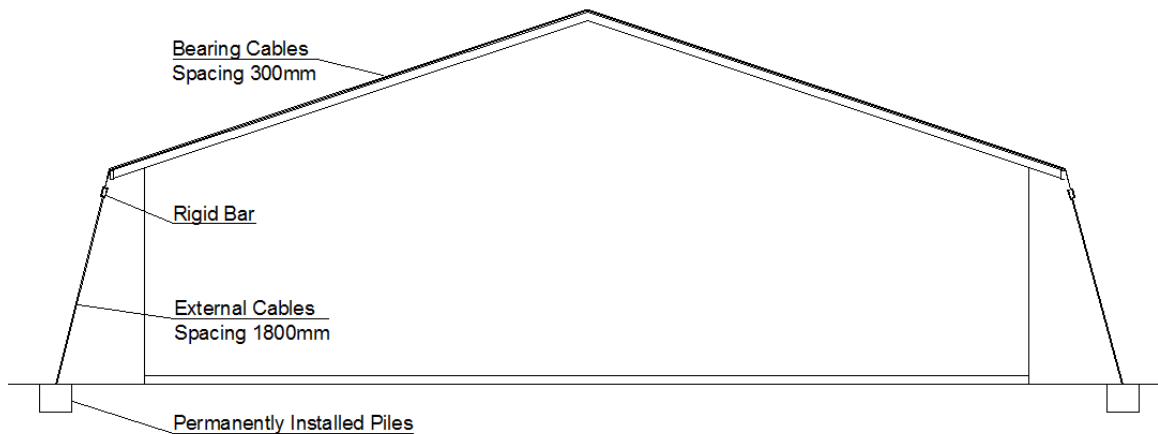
Elevation view of proposed retrofit system as applied to a gable-style roof
